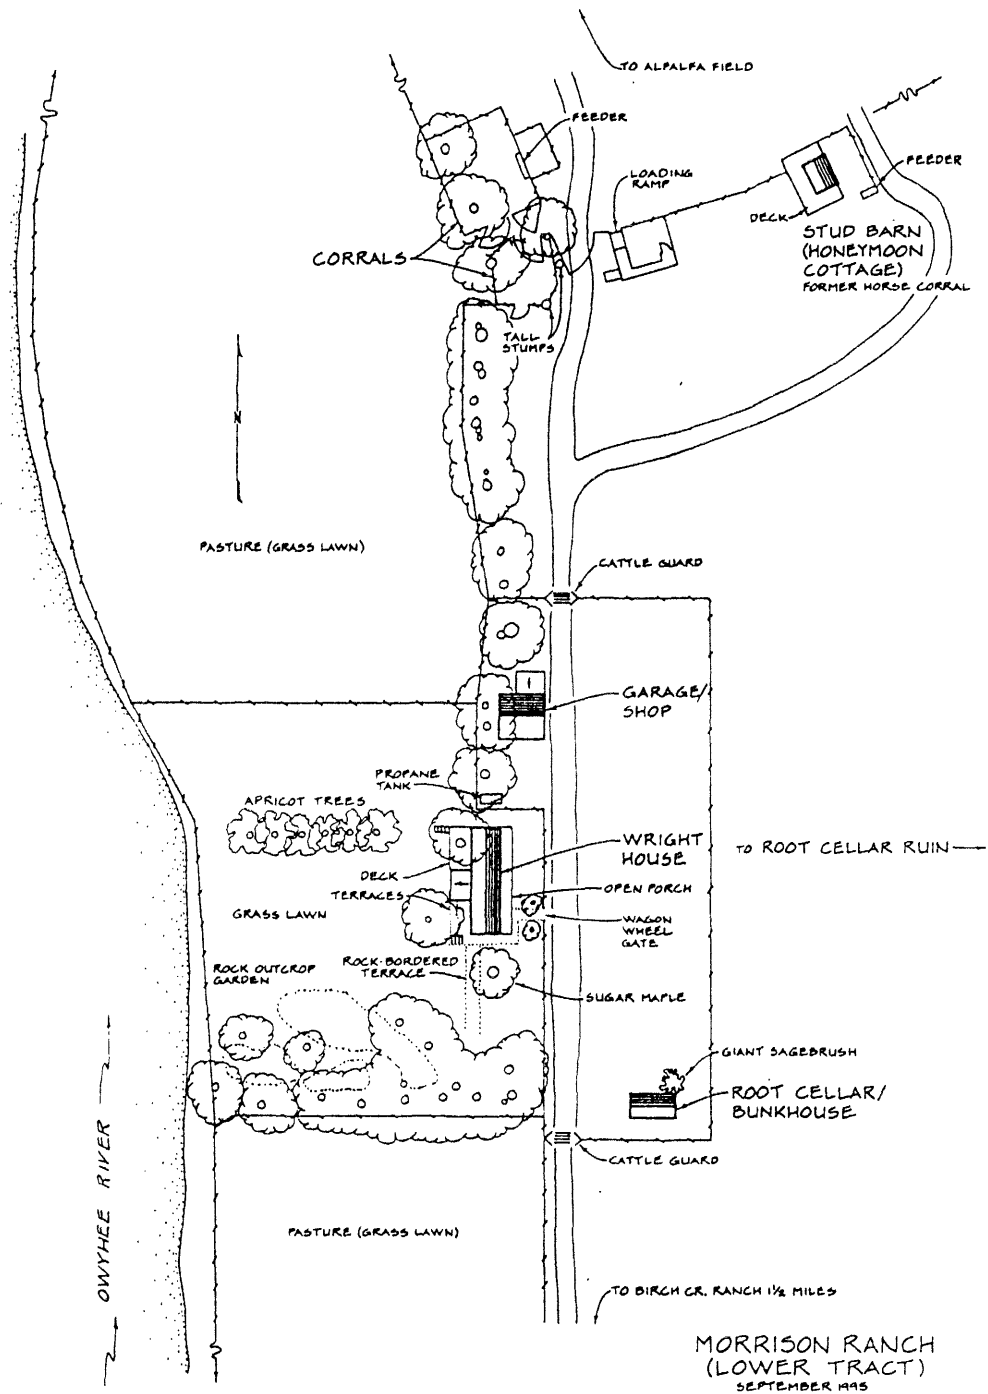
Morrison Ranch (Lower Tract) headquarters site plan (September 1995).
